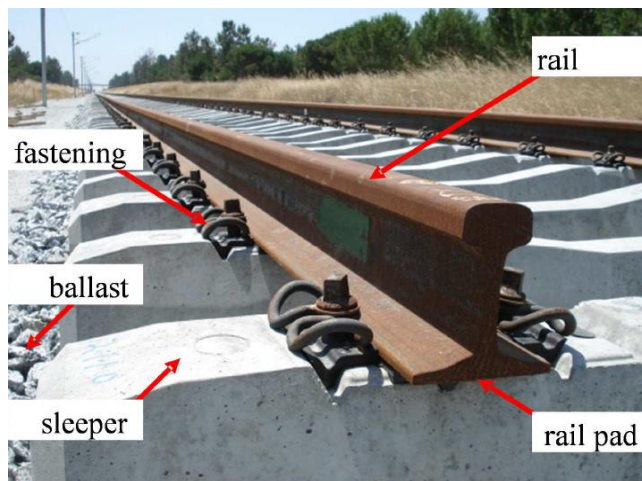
Superstructure of a ballasted track (Paixão, 2014)
